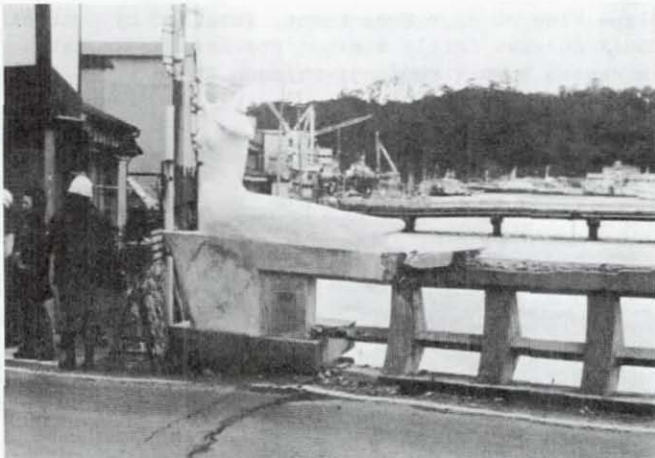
FAILURE OF CONCRETE HANDRAIL AND LATERAL MOVEMENT OF CONCRETE GIRDER (SHIN-SHIMODA BRIDGE, SHIMODA CITY)
